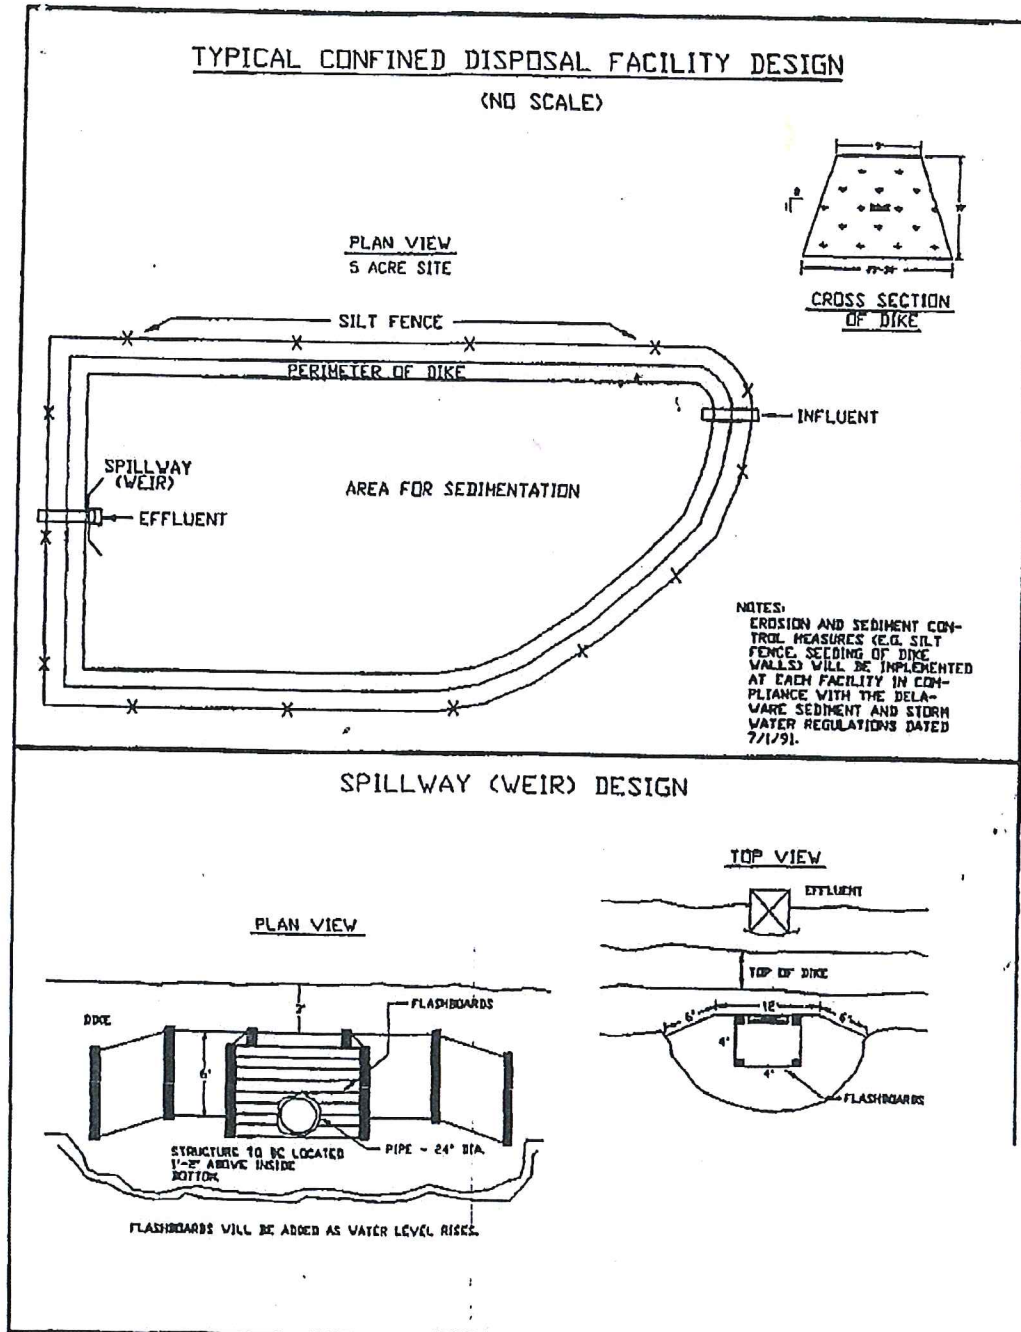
Plan view and cross-section of Confined Disposal Facility (provided by DNREC Shoreline and Waterway Management Section).
